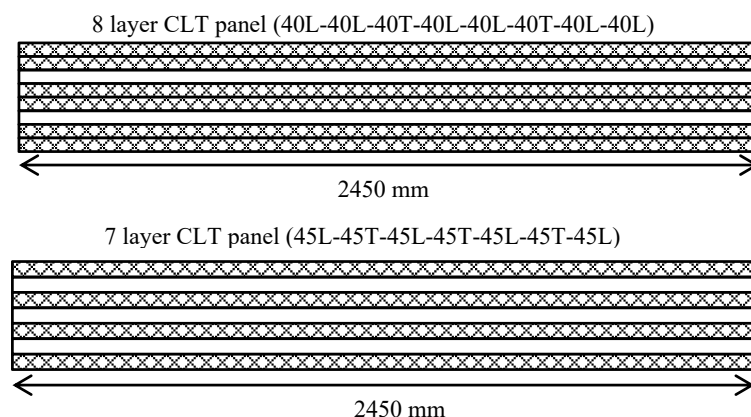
Cross sections of CLT panels for preliminary design. Top: Floor 1, 8 layered CLT panel, 320 mm thick. Bottom: Floor 2, 7 layered CLT panel, 335 mm thick.
